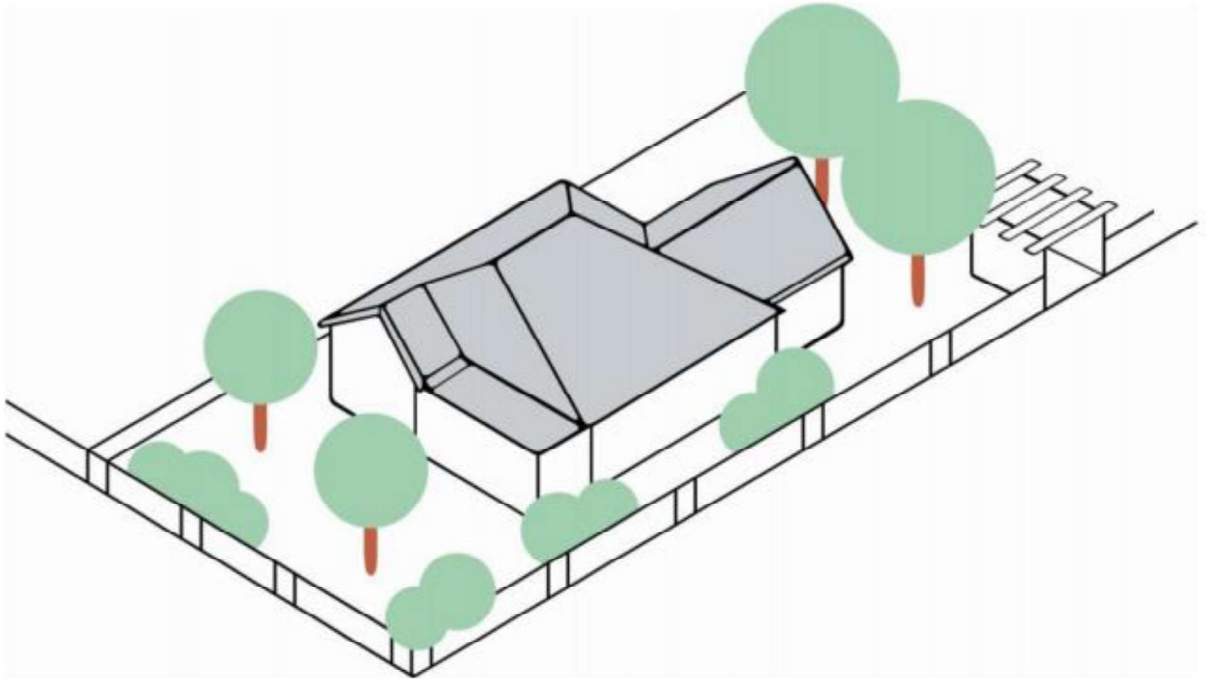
Both Street frontage elevations must be considered on corner blocks
